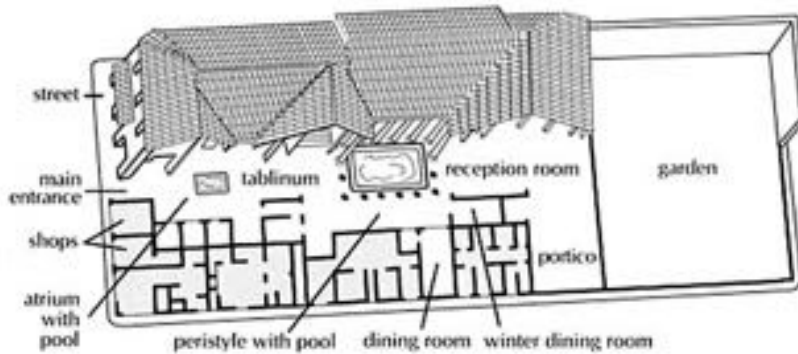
Plan and isometric view of a “typical” Roman atrium house (cf. Stokstad *Art History*, fig. 6-25)
